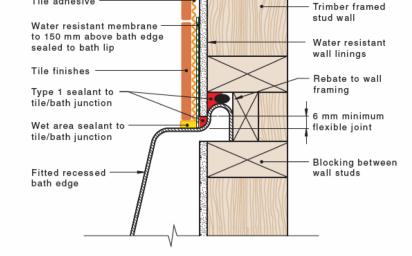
(D) — Bath with no shower over it — Fitted bath — Timber-framed wall
